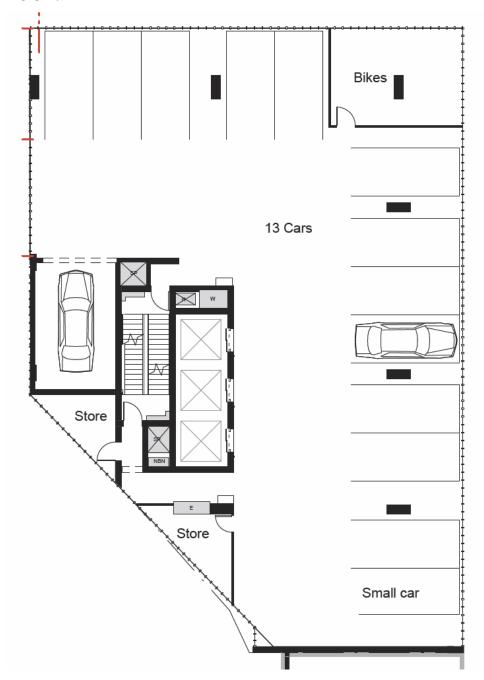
Typical car park level arrangement showing car lift access and parking arrangement
